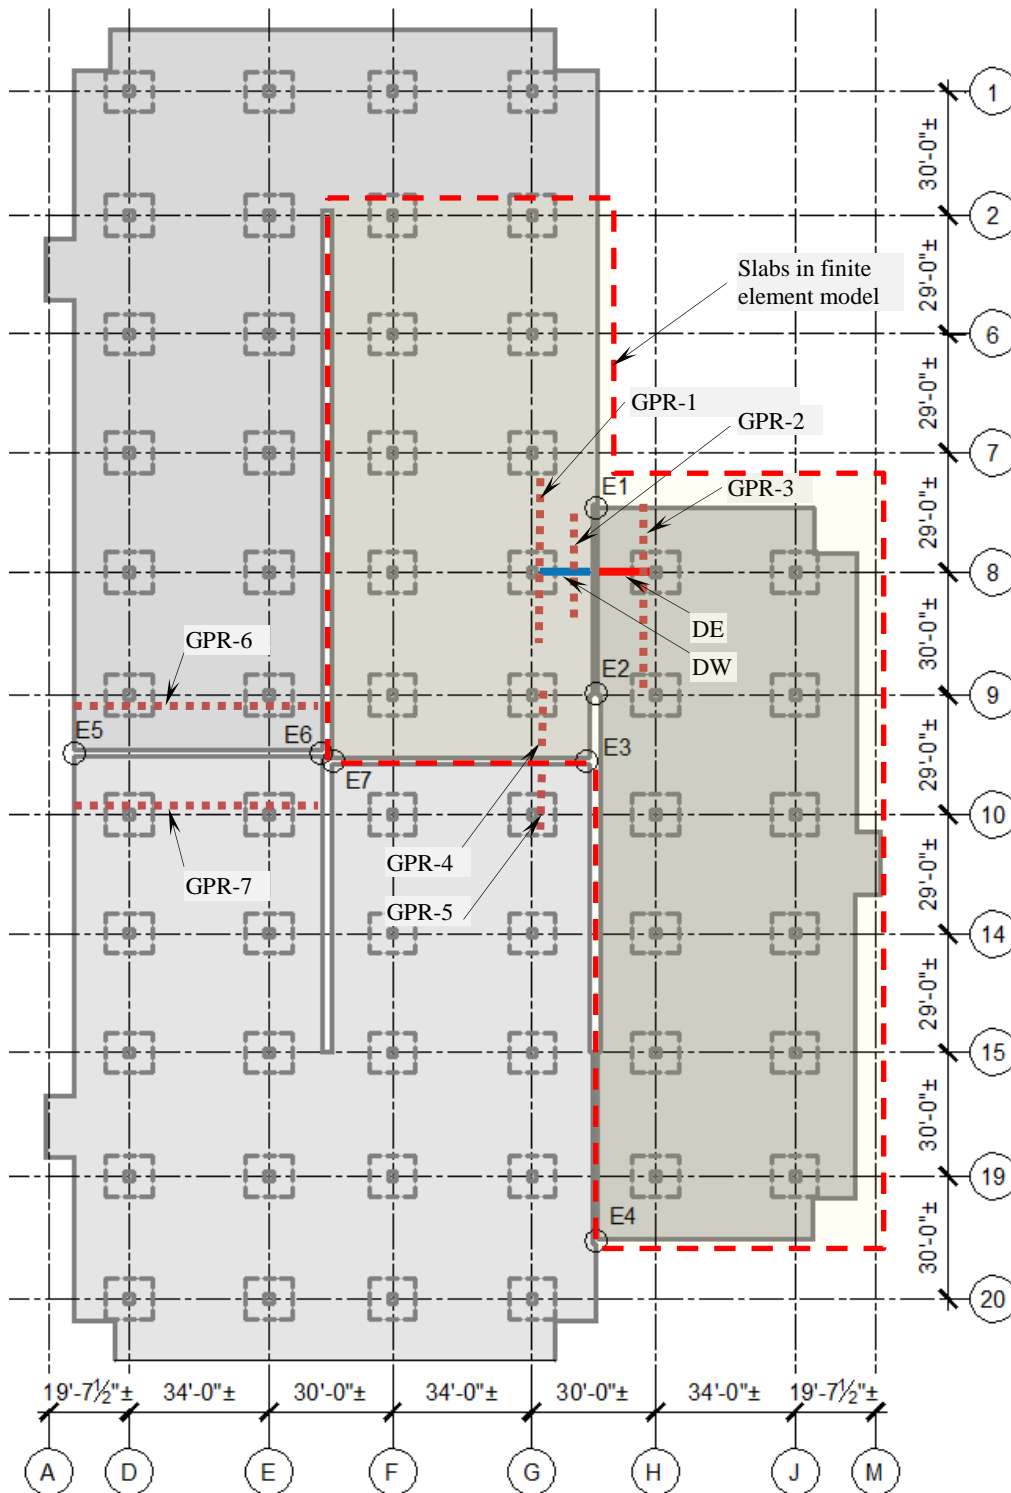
Floor plan and measurement locations (North is up in the sketch)
